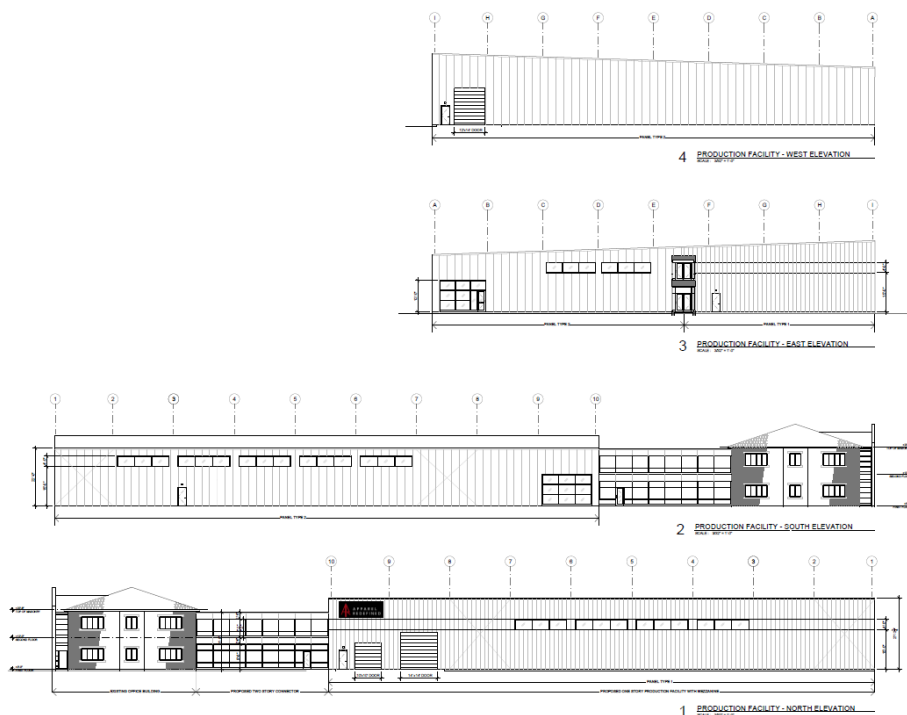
Proposed revised elevations for the new construction proposed for Apparel Redefined at 1313-1351 W 175th Street
